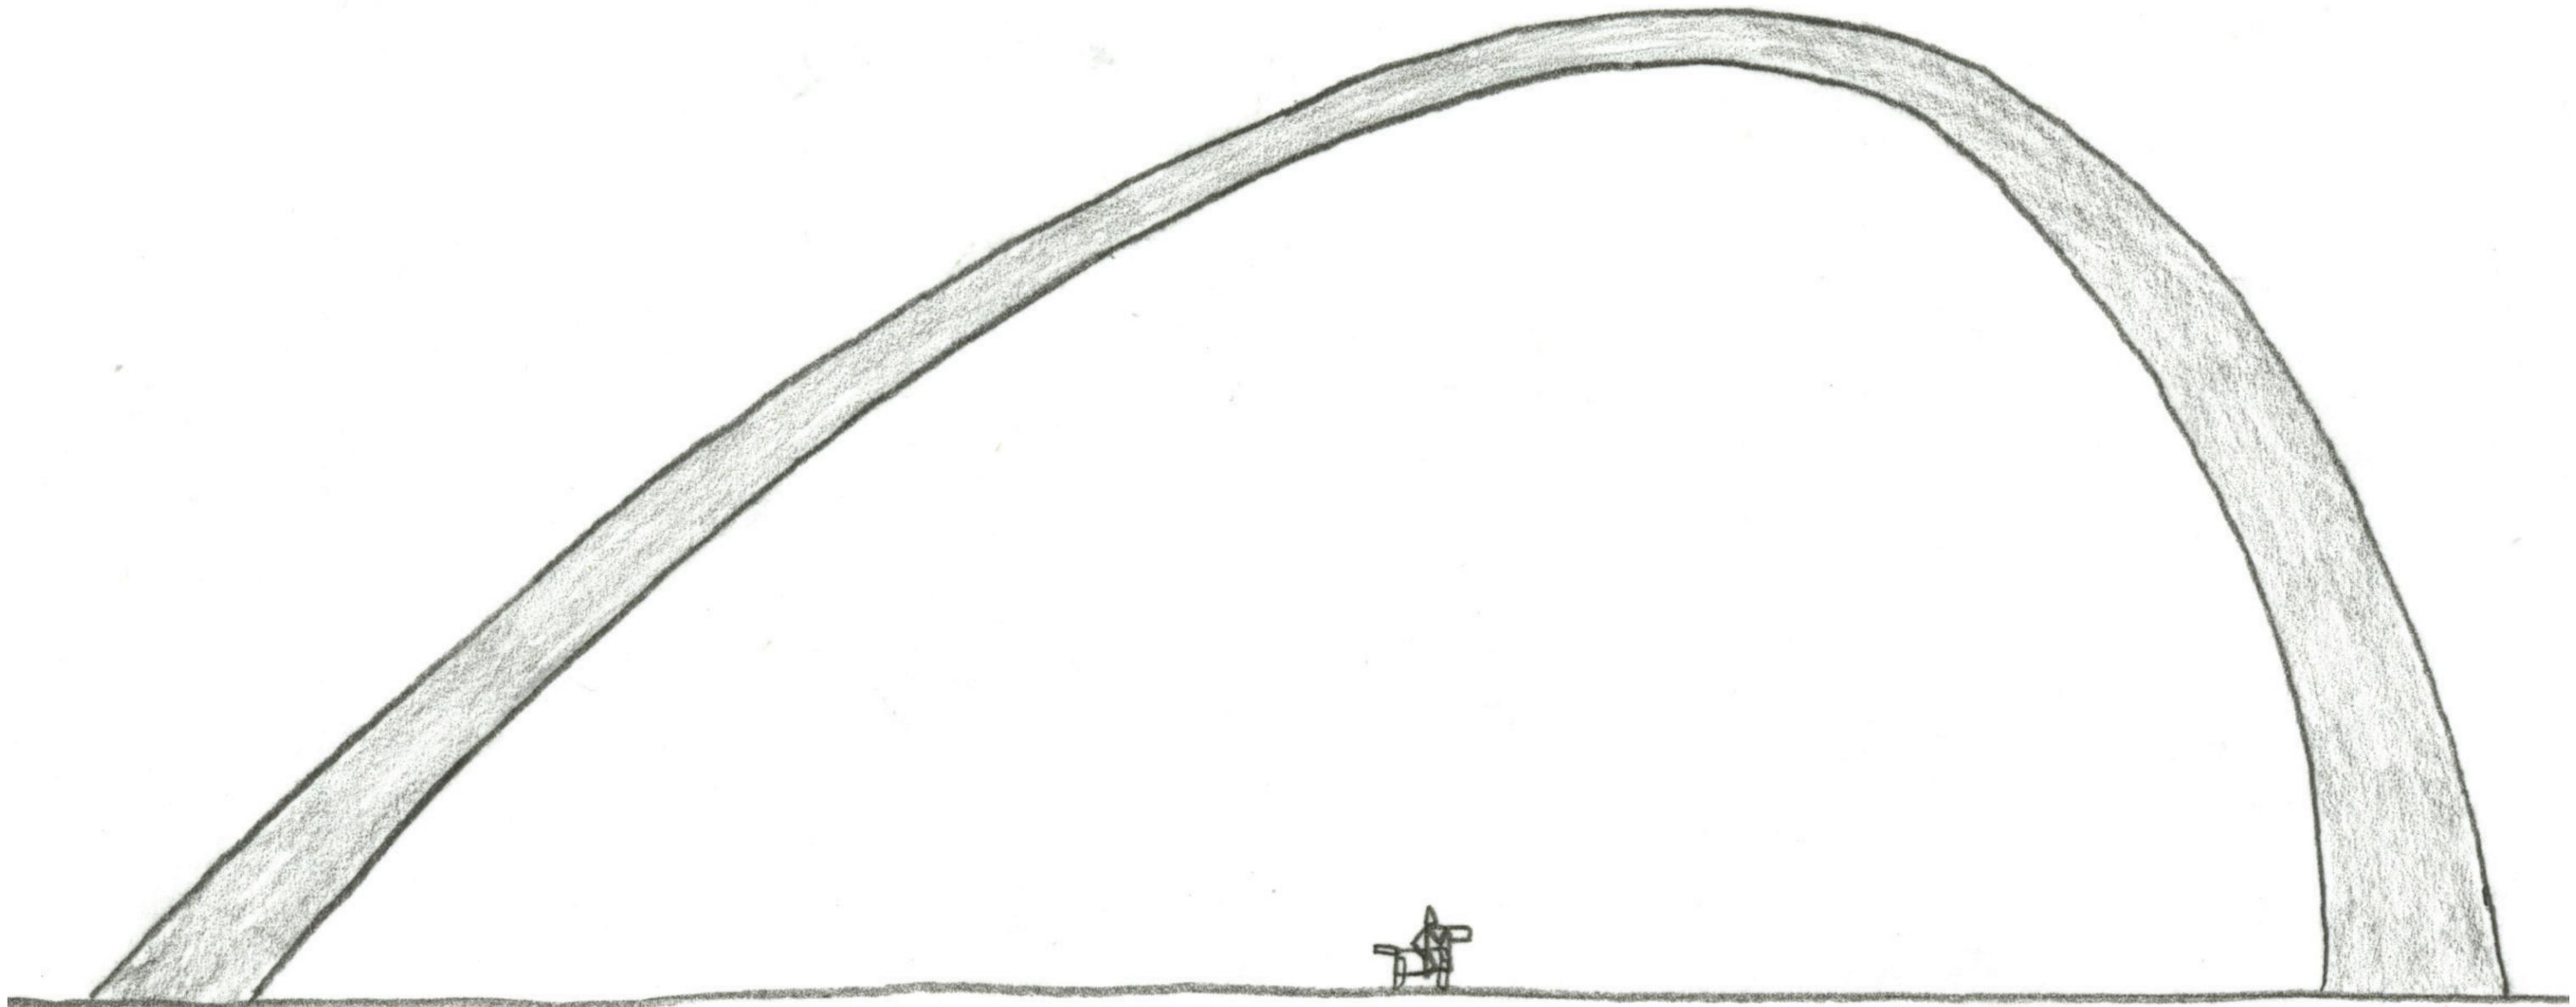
Hand Drawn Arch Elevation Preliminary Sketch
